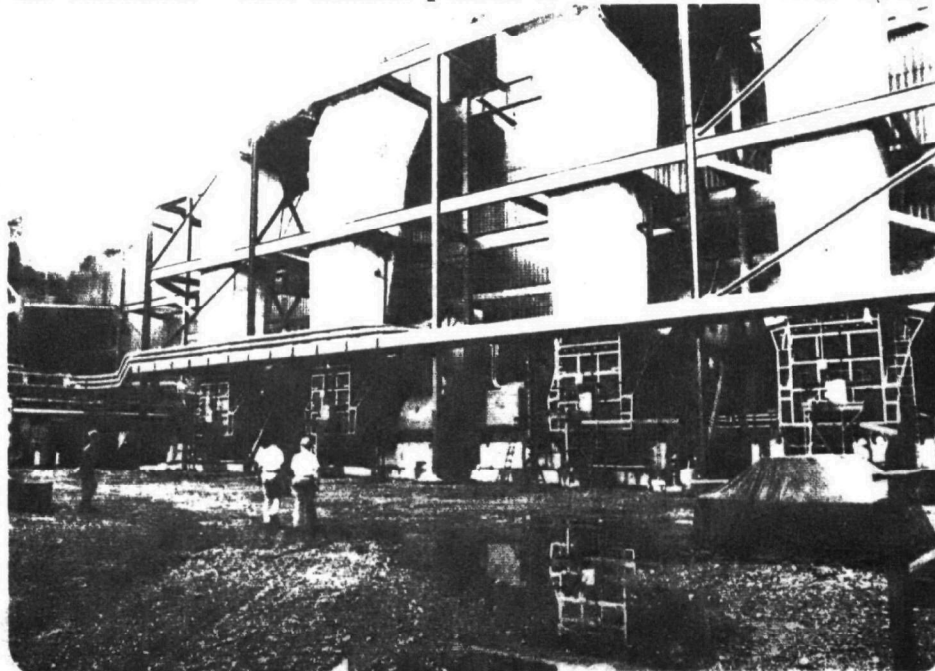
View from ground level looking southwest. The I.D. fan installations for Boilers 10 and 20 are shown respectively, from left to right across the center of the photograph.
